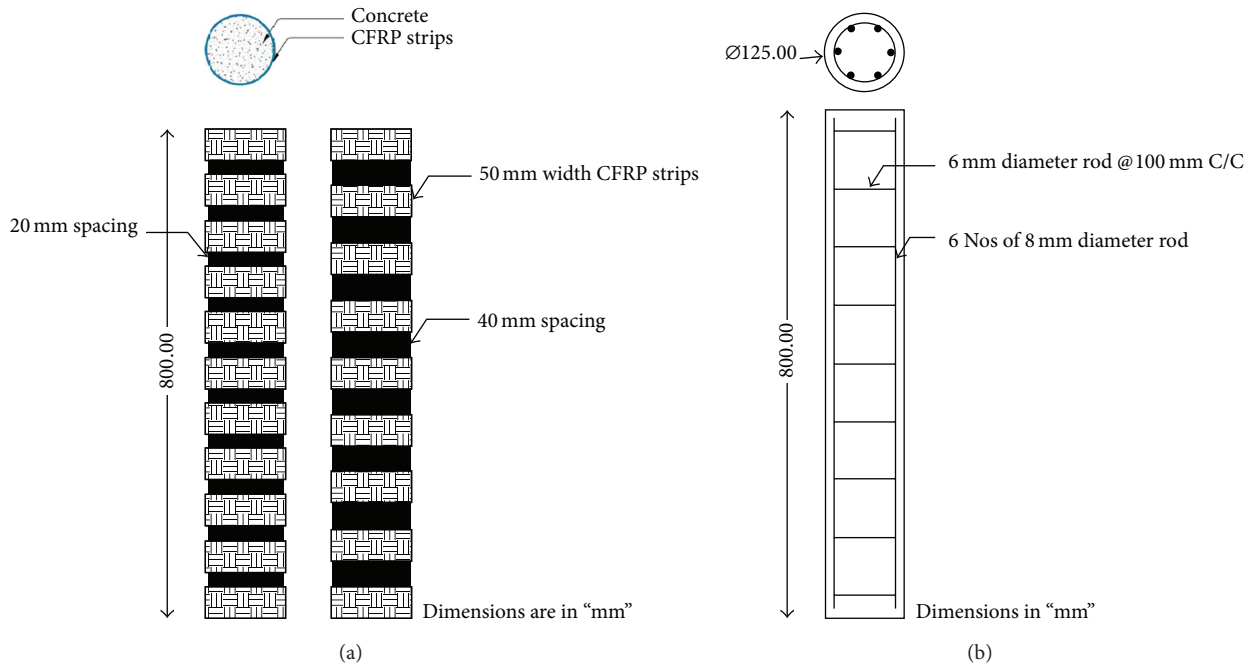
(a) CFRP strips wrapping scheme and (b) column reinforcement details.
